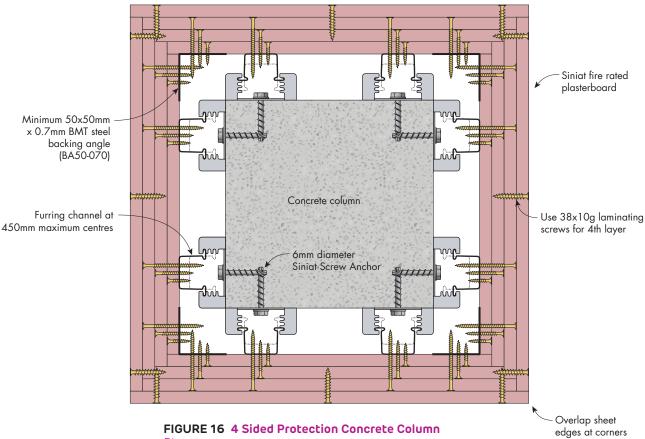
4 Sided Protection Concrete Column/Beam Plan
